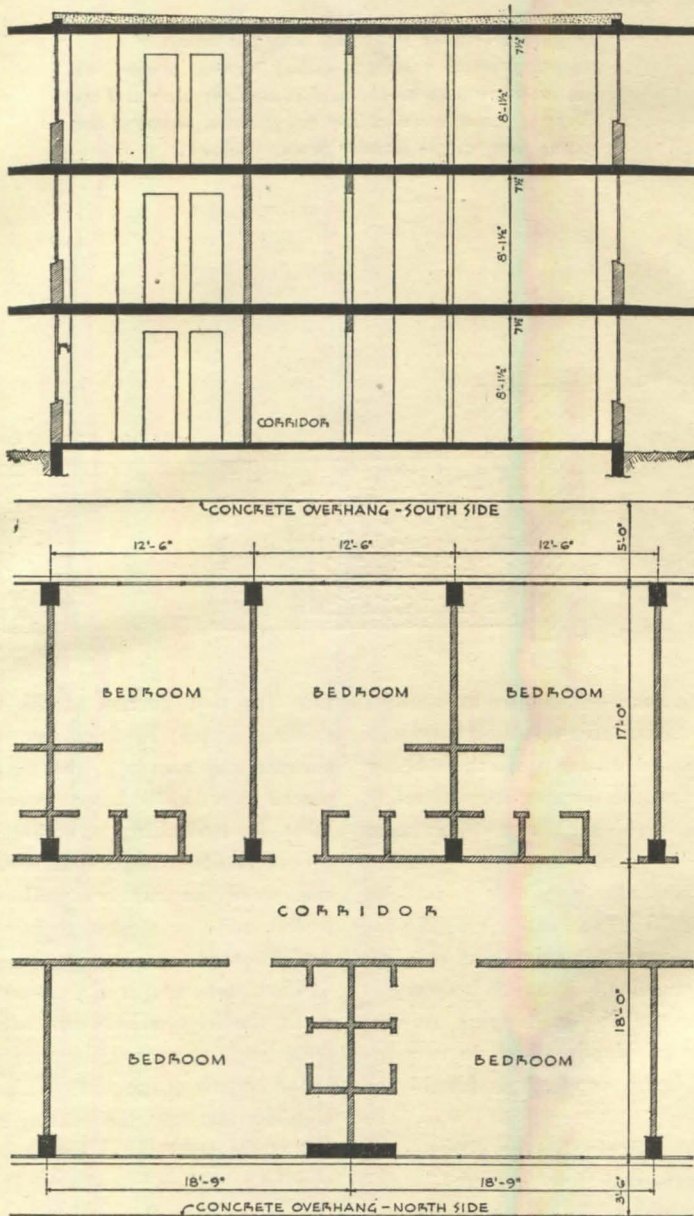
flat-plate slabs permit reduced story heights and require only simple formwork (left). Flexibility of column spacing is an additional advantage of this construction technique (below).
